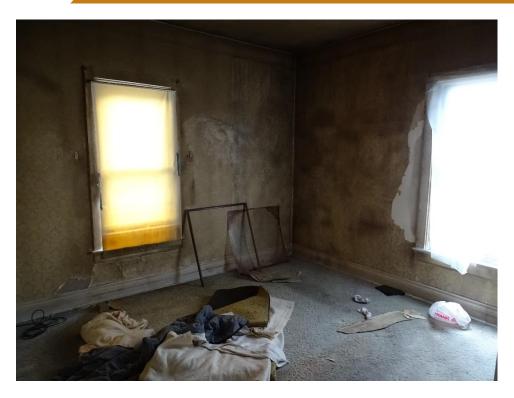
Typical interior detail, 187 Clear Creek Street. Taken from Room 1, looking southwest into Room 3 (foreground), Room 4 (background), and slightly into Room 5 (far right).
